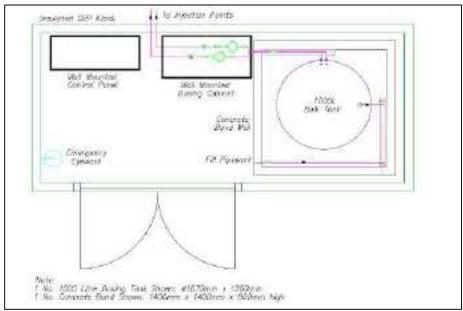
IW Schematic of a bulk tank kiosk layout in H_3PO_4 Installation with 500 litres< bulk storage \leq 6,000 litres.
